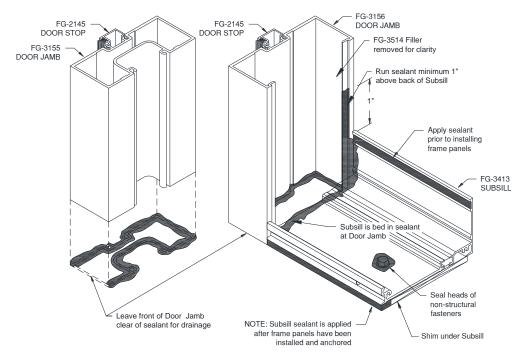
Door Jamb and Subsill Sealant Application at ArmorDefend™
